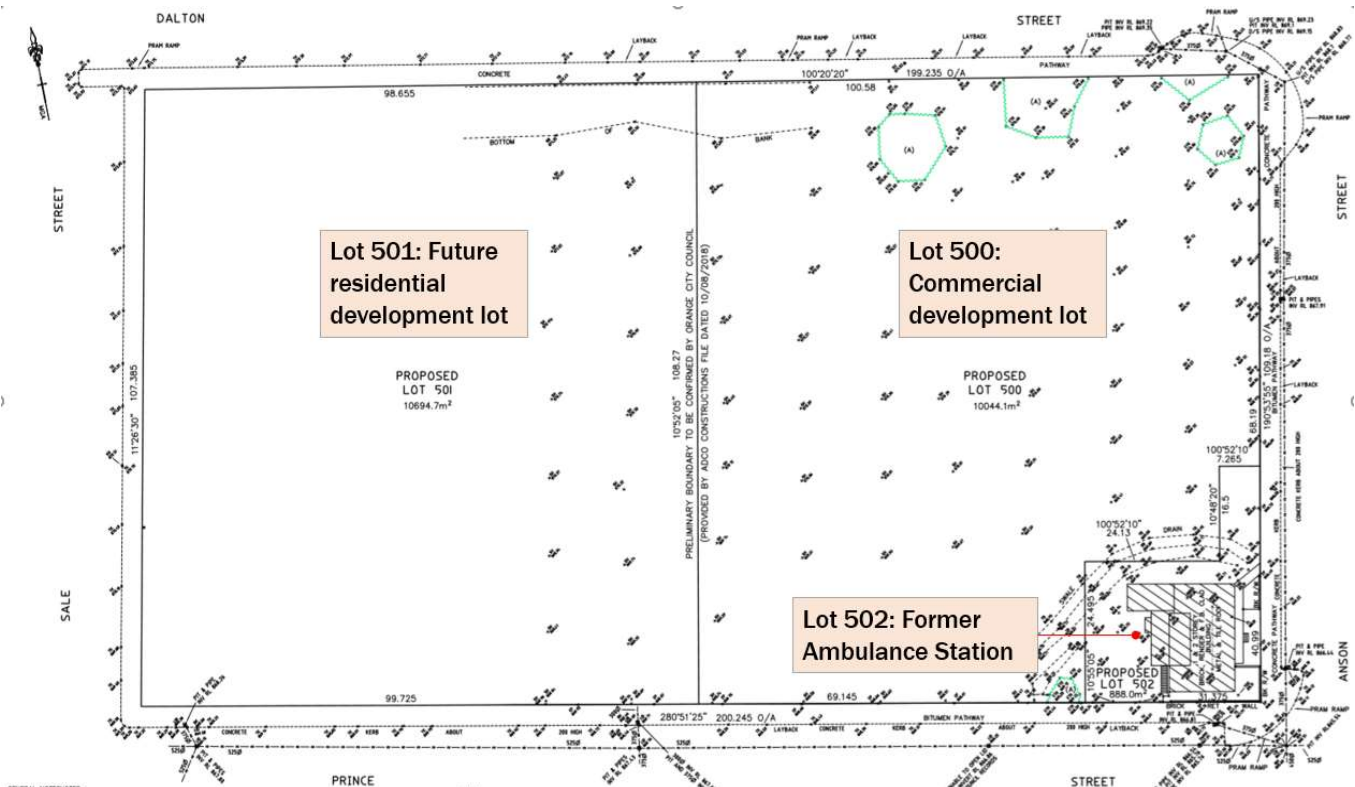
Plan of subdivision (Base source: SEE, MacroPlan)
